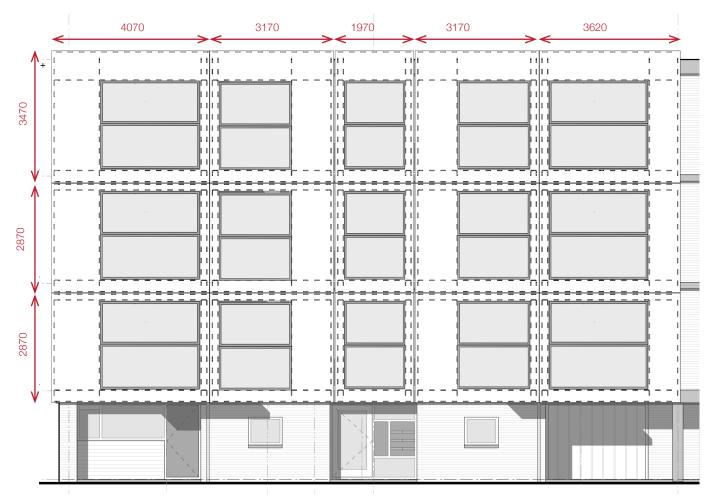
Case Study Building 2 Front facade, scale 1:100 (source: own image)
